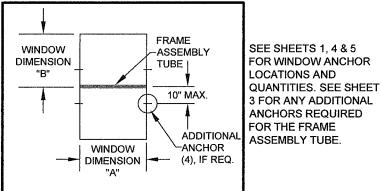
FIGURE FOR HORIZONTAL FRAME ASSEMBLY TUBE
